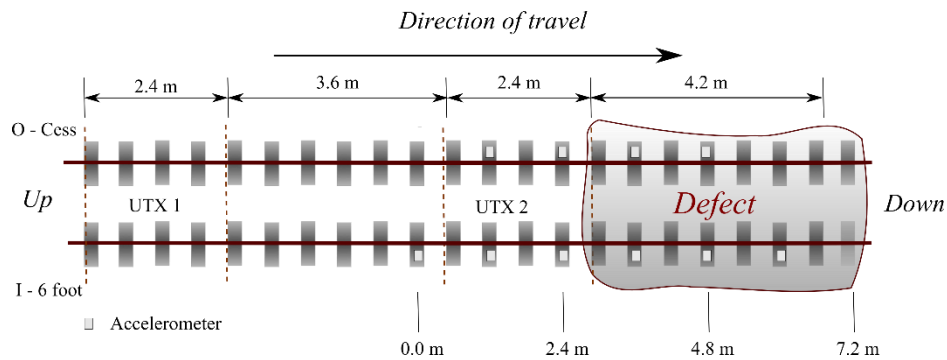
Transducer locations and UTX positions for the North Downs Tunnel defect zone.
